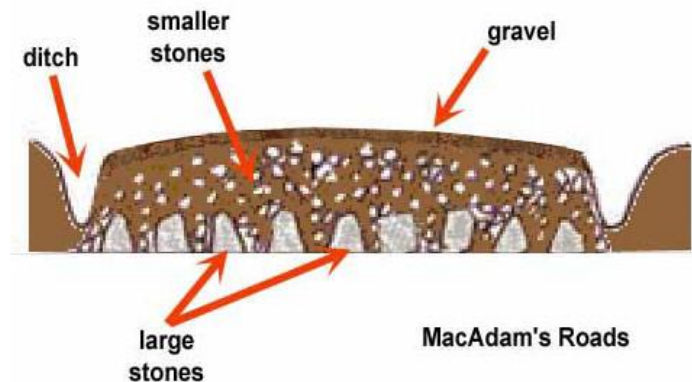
Macadam Pavement (Burchill et al, 2014)
